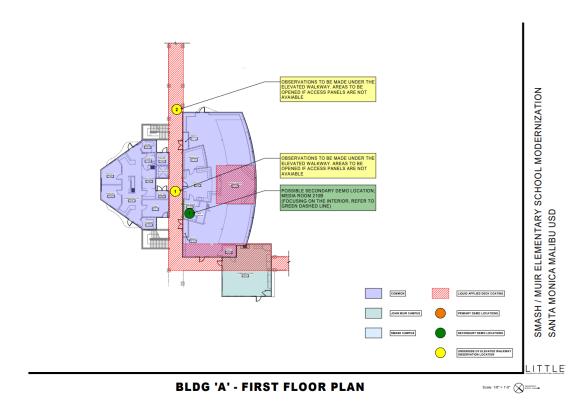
Demo Locations, Bldg A_First Floor Plan_Demo Locations.
